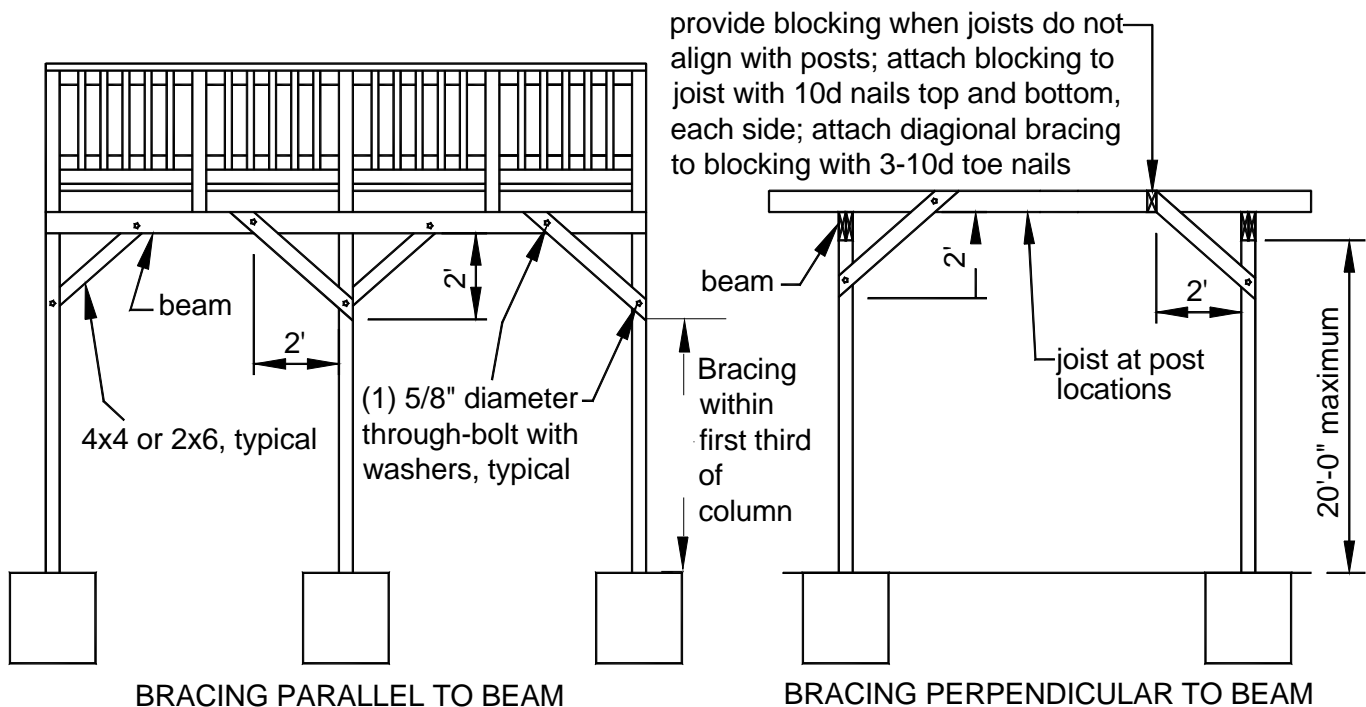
DIAGONAL BRACING REQUIREMENTS
